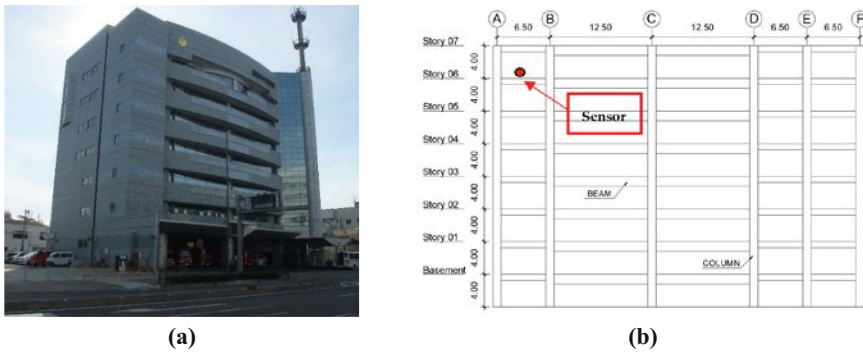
(a) Toyohashi Fire Station Building. (b) Elevation drawing view. [4]
